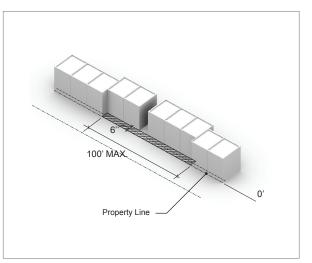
I: Mews streetwall example - Building setbacks greater than three feet and parallel to the property line are limited to a maximum of 100 square feet or 50% of street frontage.
